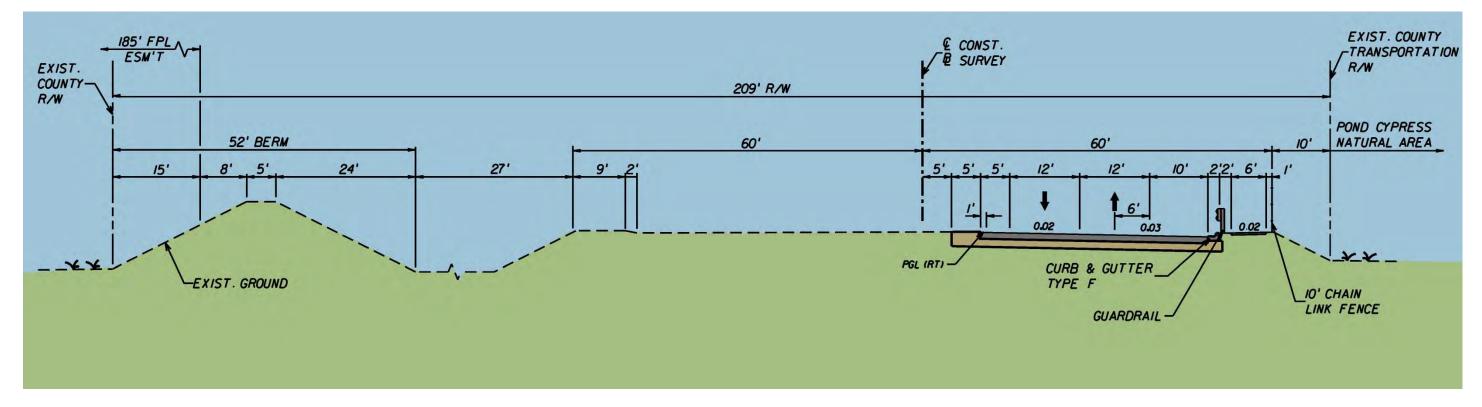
Proposed Typical Section – Madrid Street to 40th Street
